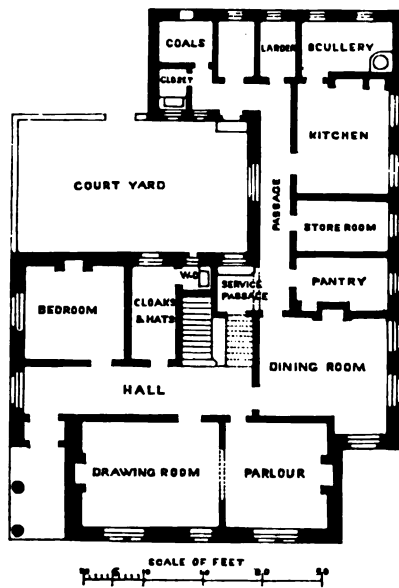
PLAN C.—HOUSE WITH ALL THE LIVING-ROOMS TO THE FRONT.
